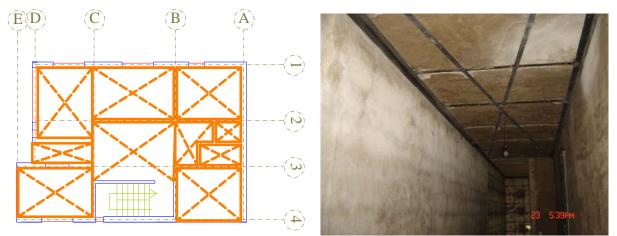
Locations of steel diagonals and frames at floors (left), and their construction (right)
